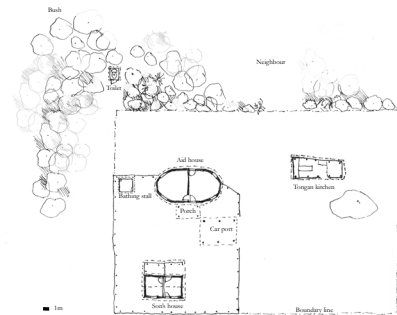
Site and floor plan sketch of Kaho's property, author May 2014
